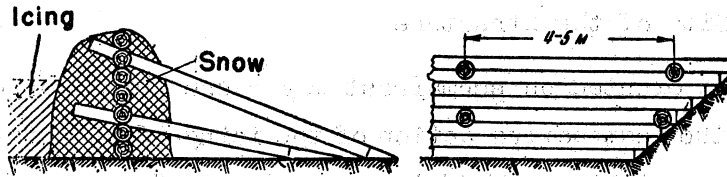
Timber Barrier Against Icing, of Type Used on the Amur-Yakutsk Highway
